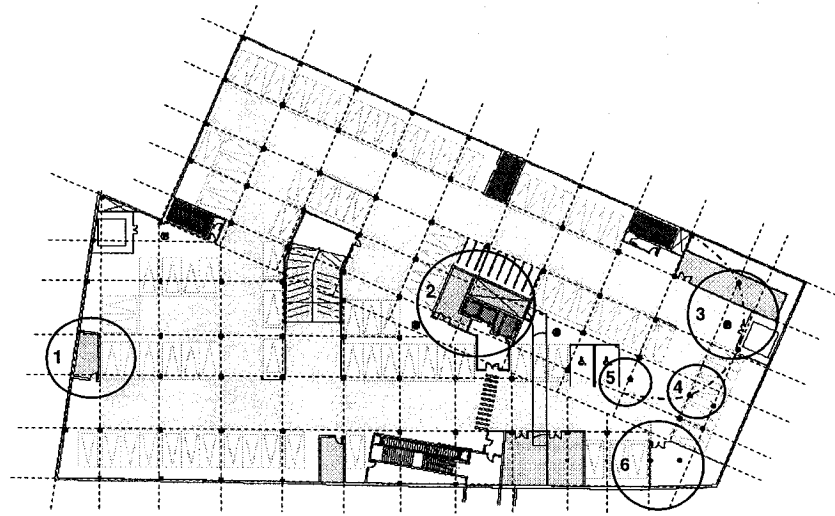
ETS building, floor plan of the second basement showing local misfits
